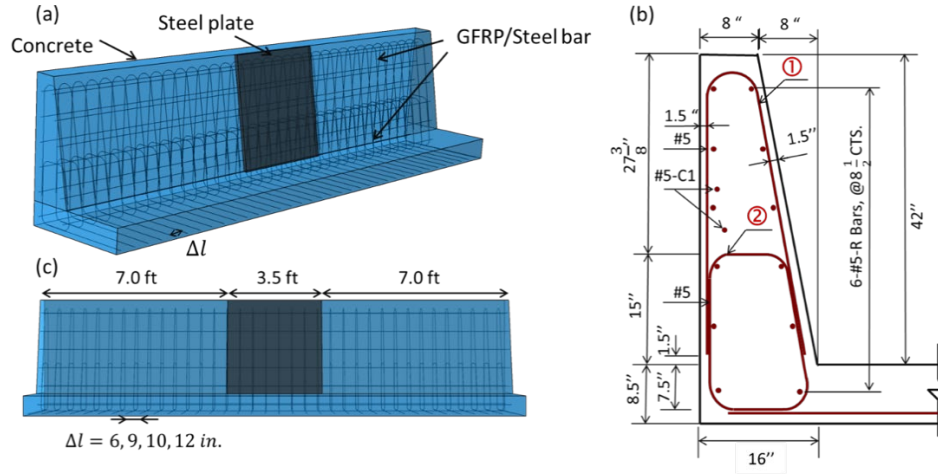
(a) GFRP/steel reinforced concrete barrier model construction. (b) GFRP/steel reinforcements. (c) Size parameters.
